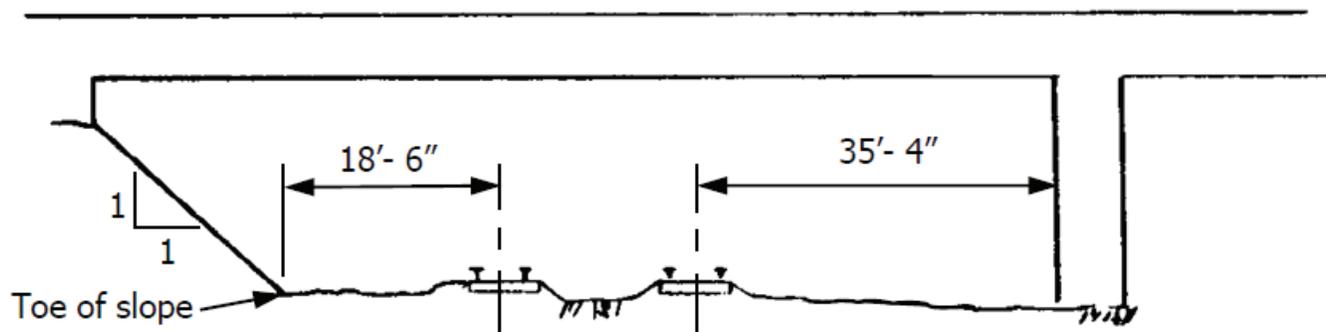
Bridge elevation view indicating horizontal offset for two railroad tracks below the bridge.
